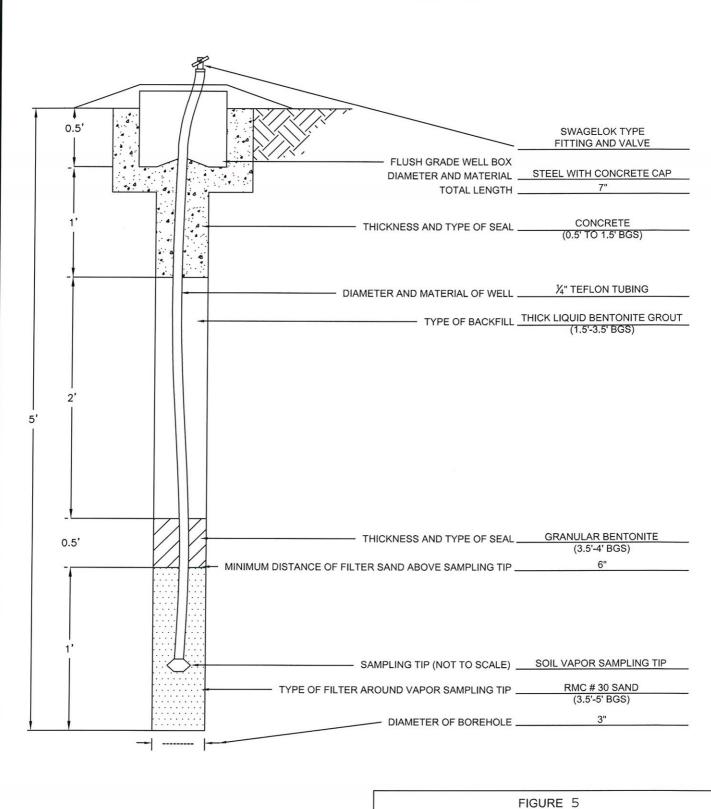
SOIL GAS WELL CONSTRUCTION DETAIL
